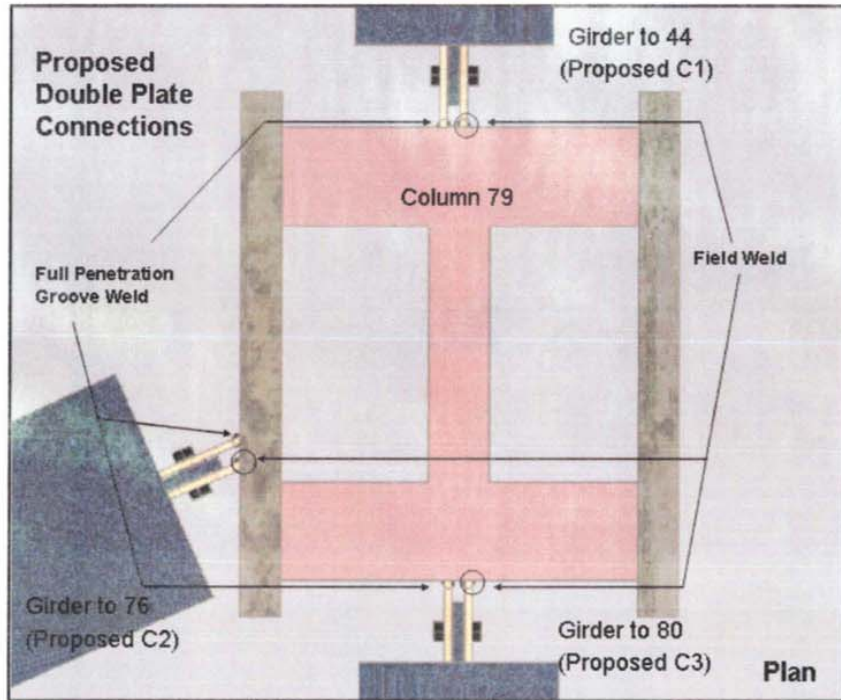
Plan View of Proposed Connections at Column 79 to Meet 2% Axial Bracing Force Requirement.
